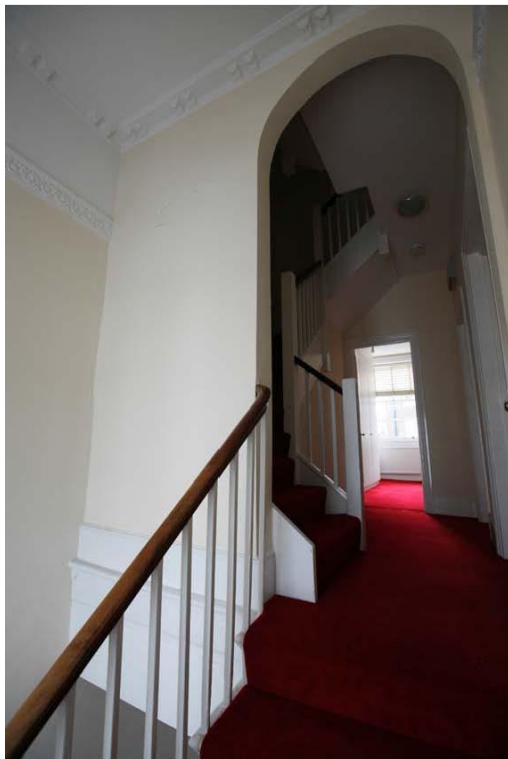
The bottom of the non original staircase from second to fourth floors – projecting into the second floor landing.
